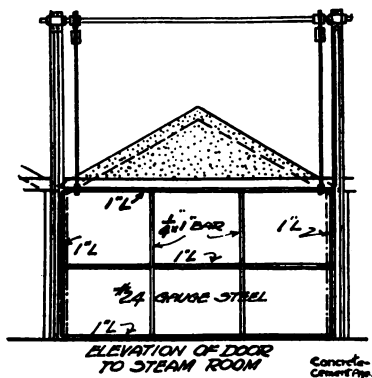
SKETCH OF LIGHT METAL DOOR FOR STEAM ROOM
